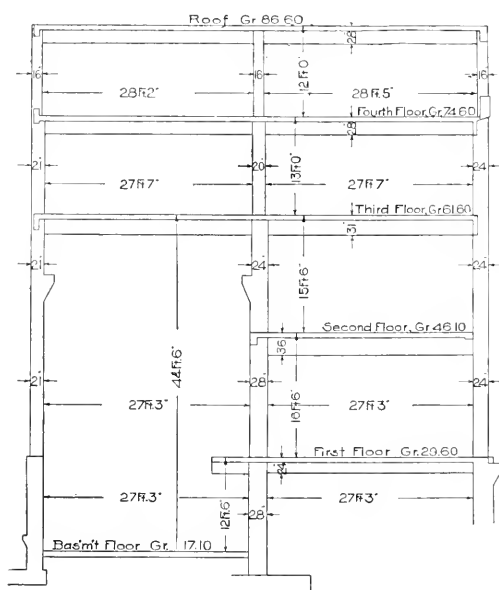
CROSS SECTION OF BUILDING ON MAJOR COURT.
